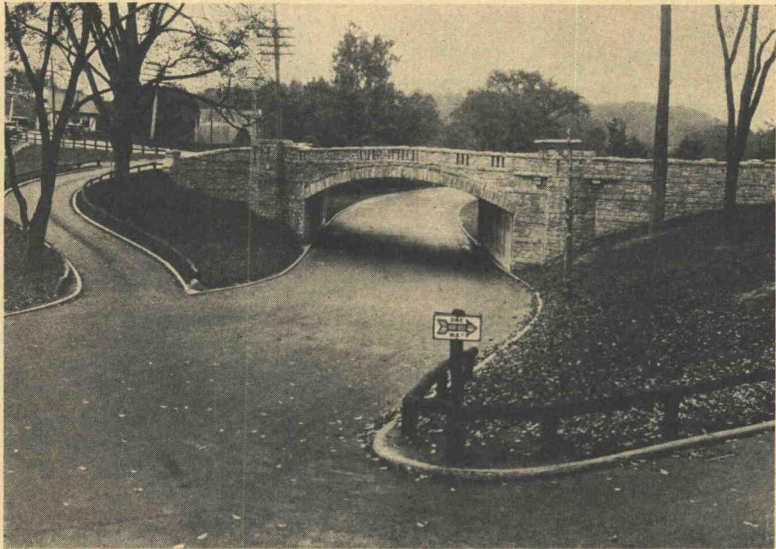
Rigid Frame Bridge, Bronx River Parkway, New York
